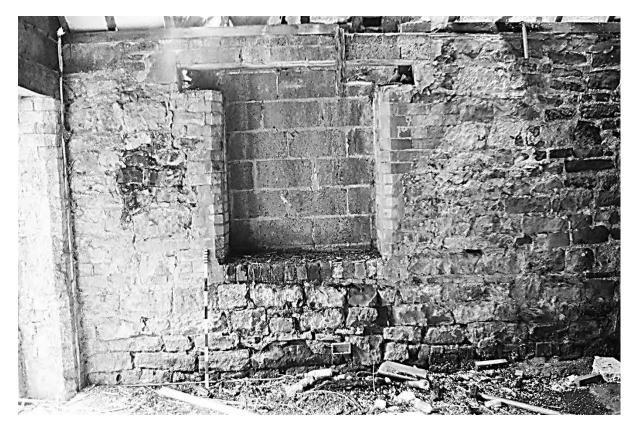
Farm Building 3: Room 3.2 (Film 1/2). Facing West.
